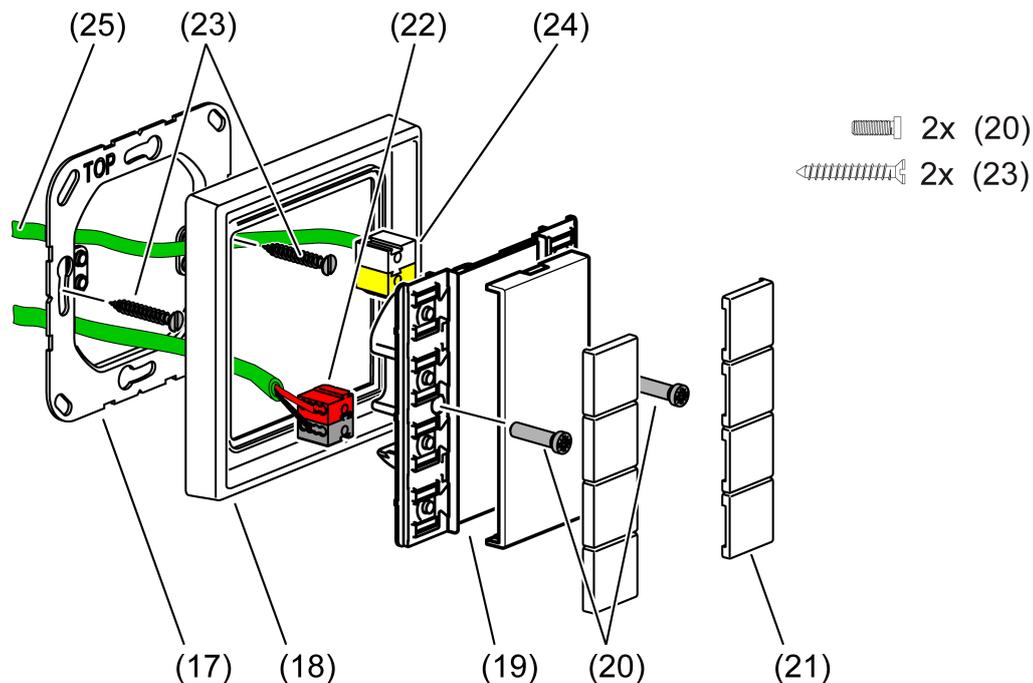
Mounting the push-button sensor module with connection of a push-button sensor extension module
